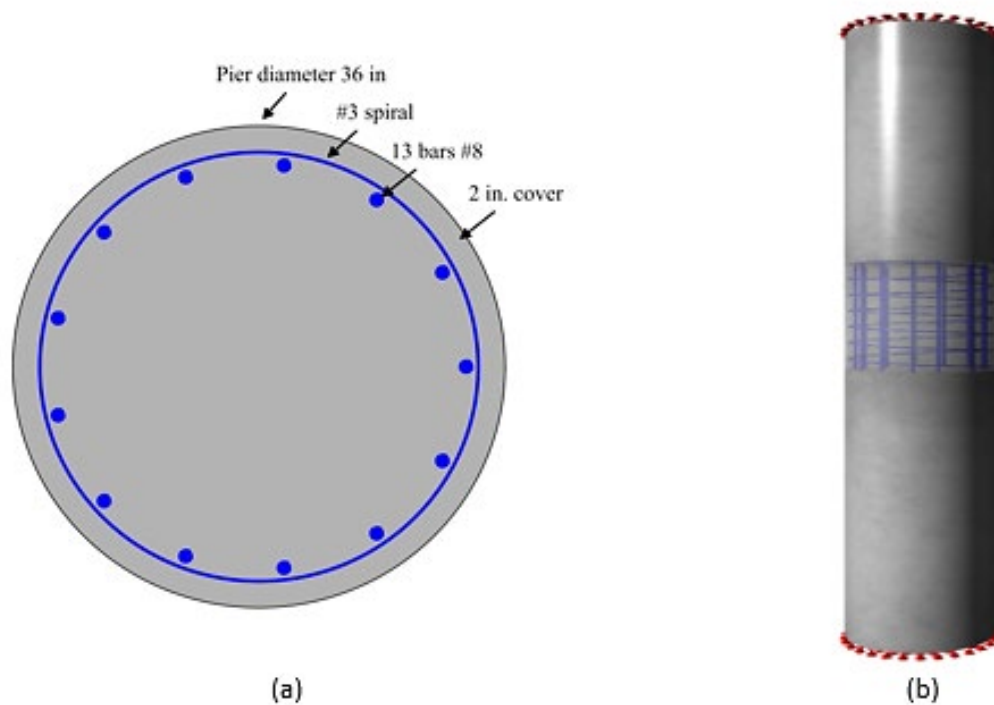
(a) Pier Cross-Section and Details, (b) Boundary Condition
